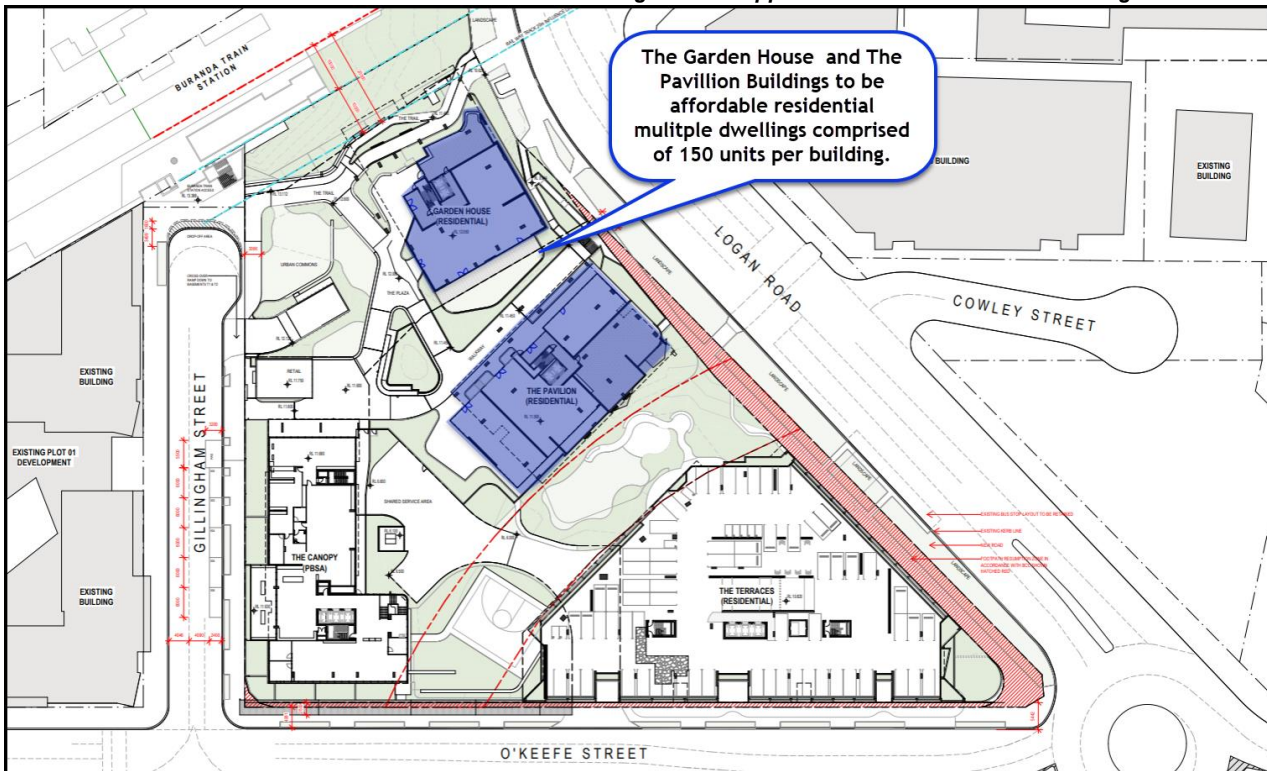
Proposed Site Plan Buranda TOD Stage 2 – Eastern Precinct
